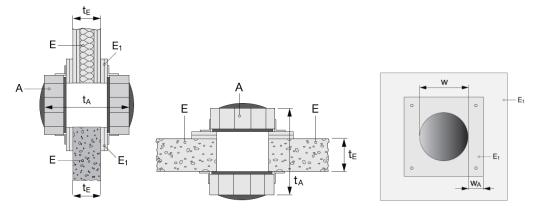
Aperture Framing/Beading and Position of the Seal in Walls/Floors
